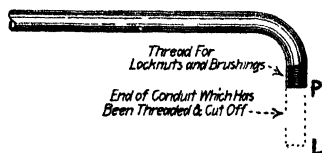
Conduit end cut off and ready for insertion in outlet box.
